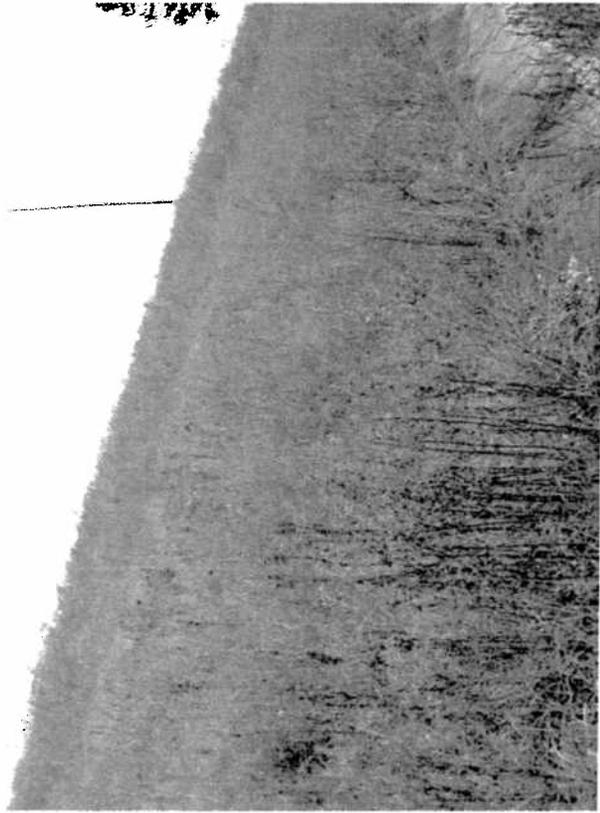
Maximum Section with Concrete-Lined Ditch at Toe
